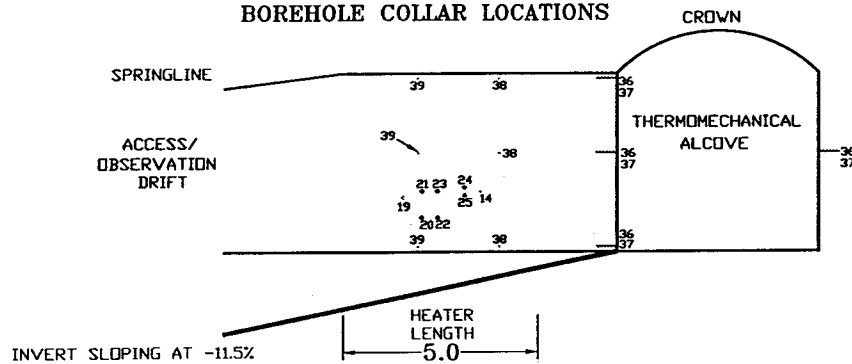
Layout and borehole arrangement in the Single Heater Test.
